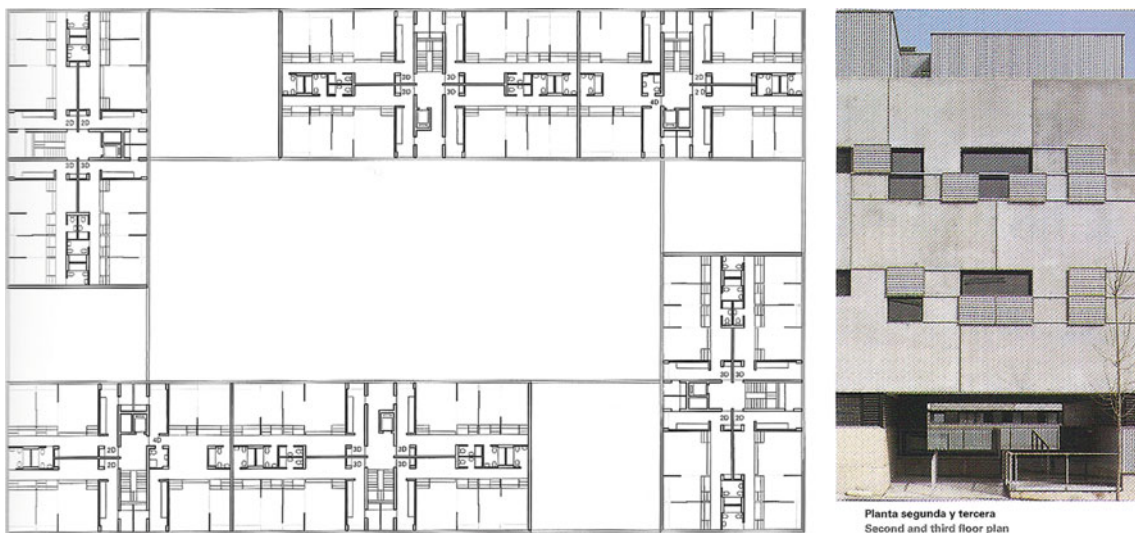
Aranguren and Gallegos, 64 social dwellings in the Carabanchel PAU, Madrid, 2001–2003. Plan and photograph of the elevation
